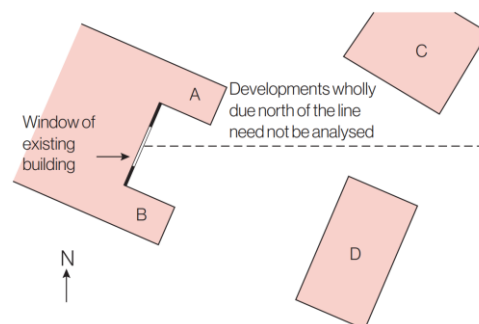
In analysing the sunlighting impact on the existing window, no check need be made for proposed extension A and new building C, as they lie within 90° of due north of the window. Proposed extension B should be checked, as should new building D if it subtends more than 25° to the horizontal, measured in section from the centre of the window.
